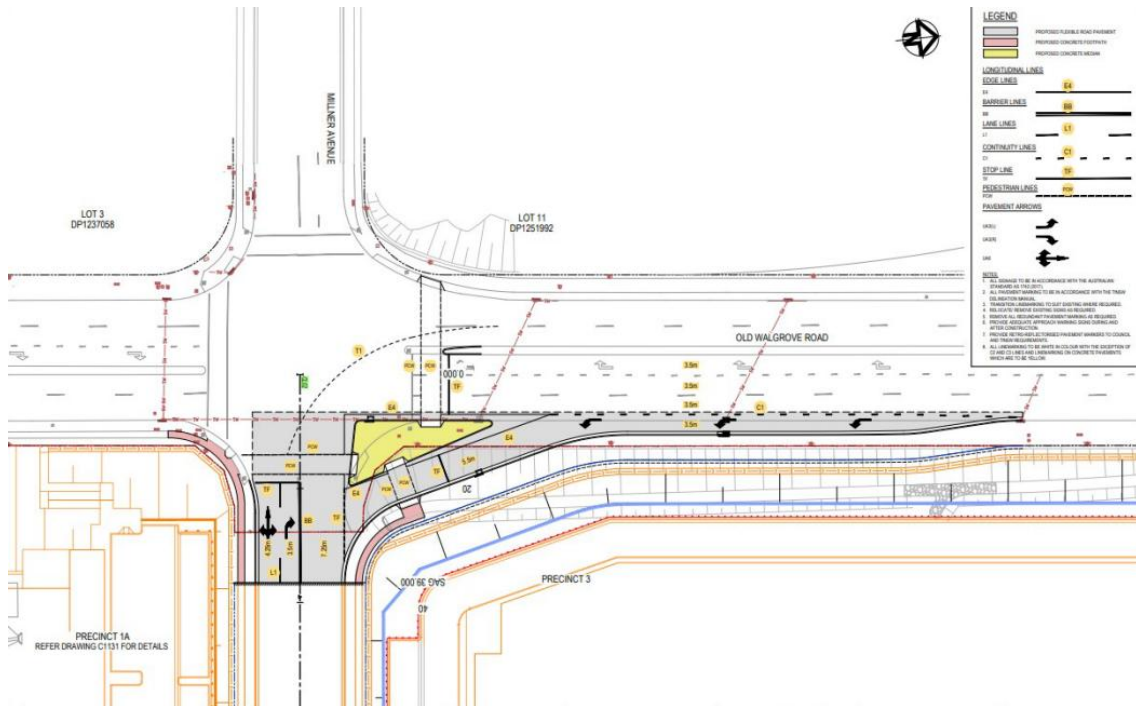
Approved intersection upgrade works at Old Wallgrove Road/Millner Avenue (Source: SSD 37486043 Consent)
